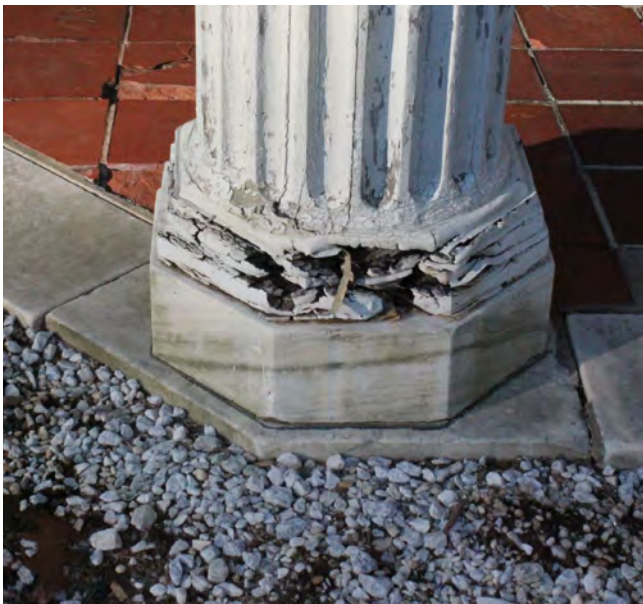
Non-original octagonal wood column base at south porch. (HA, 2015)
